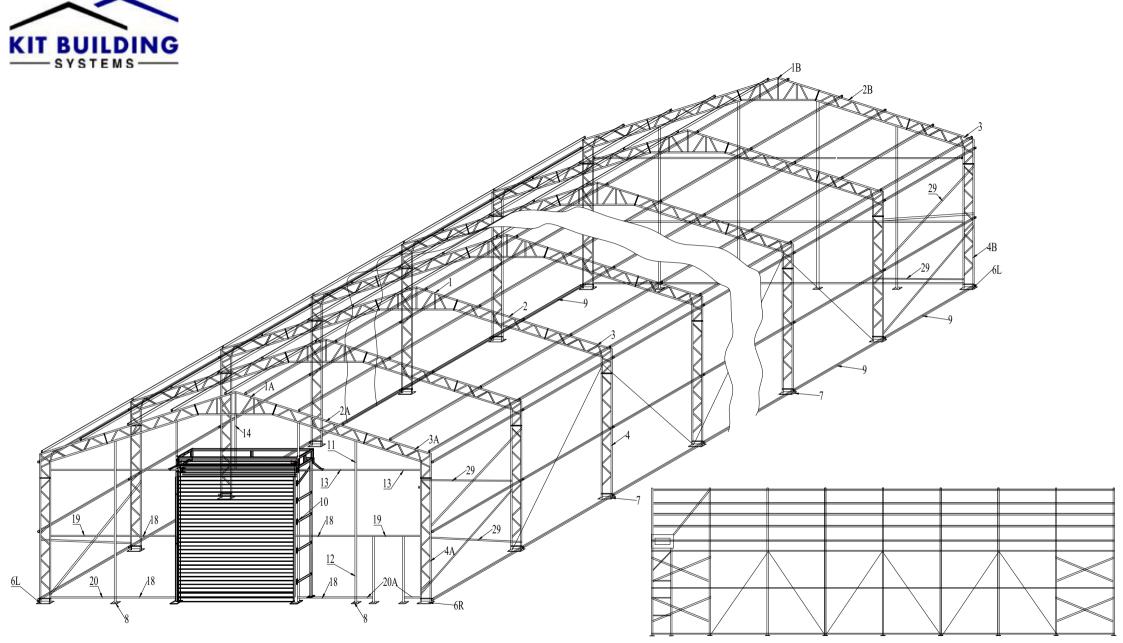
Sketch of Trussed Frame Shelter Size: L20 x W12 x H6.4m
